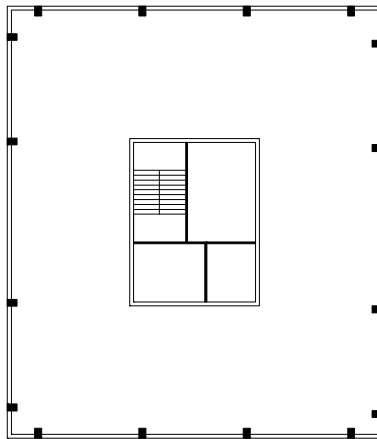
A plan of the study-building, showing its structural system, i.e. a central shear core and a column-beam system around the exterior perimeter.
